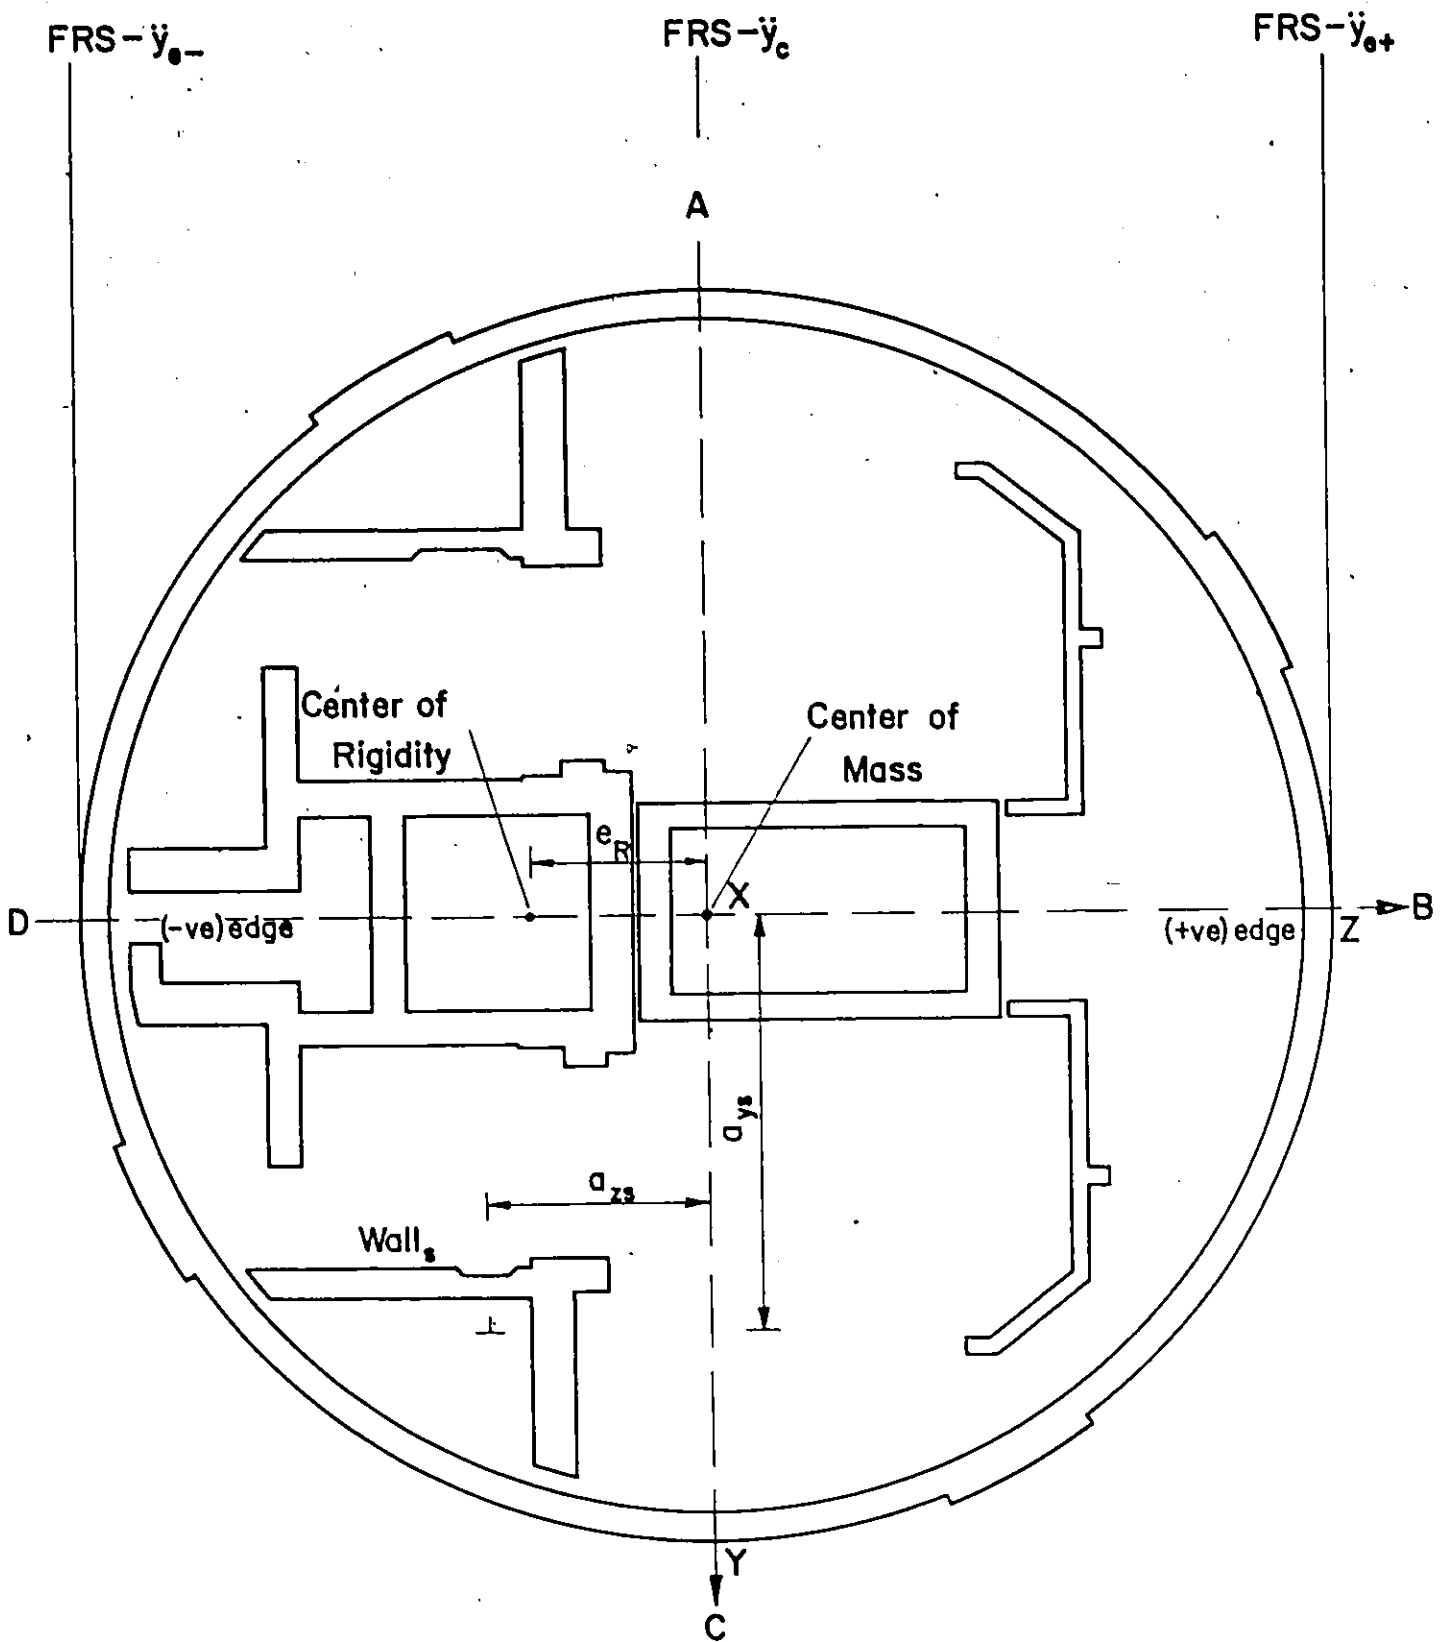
Structural Plan for a Typical CANDU Reactor Building
